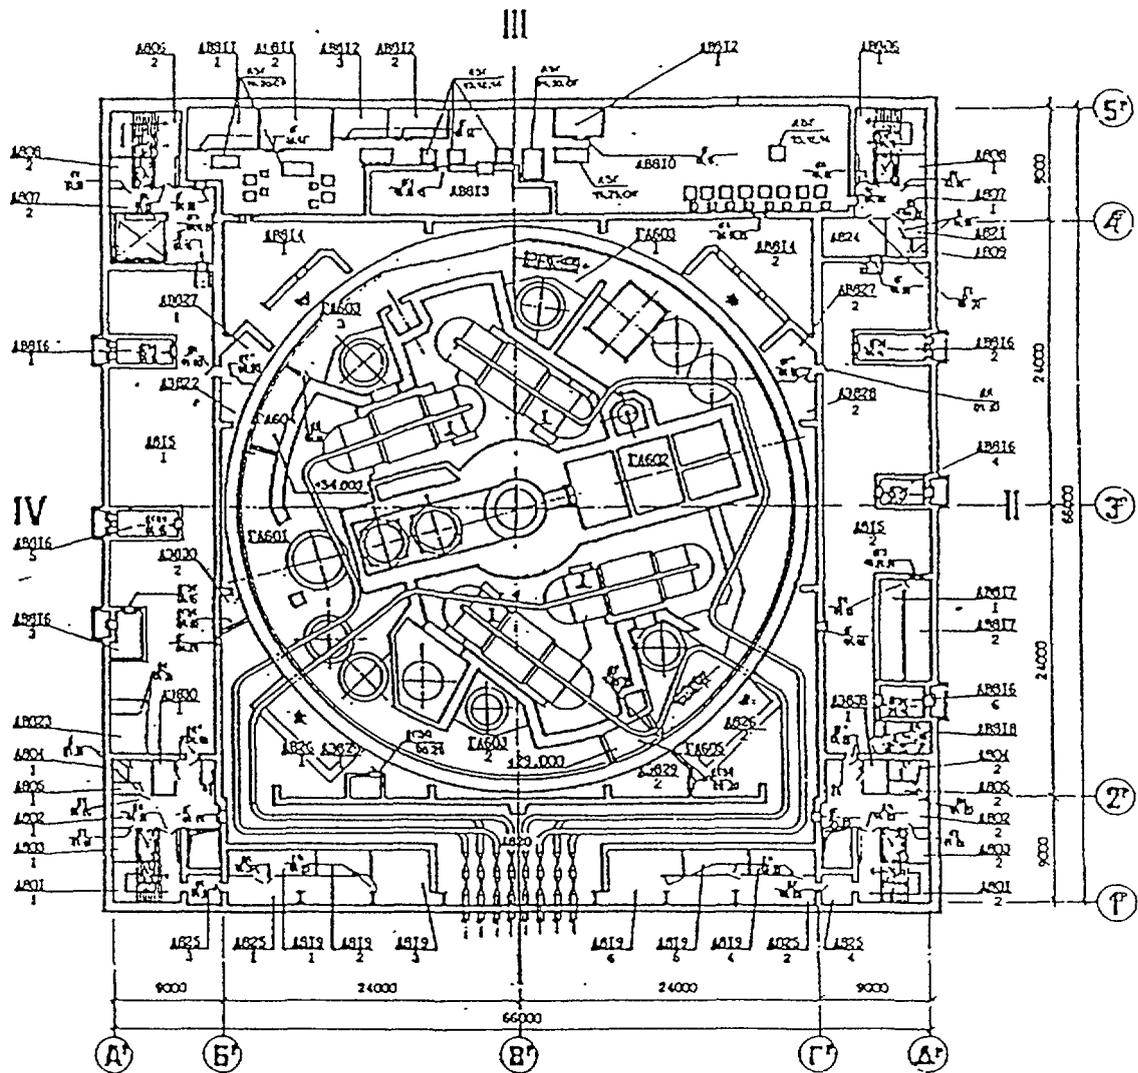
Plan view of a WWER-1000 MW reactor building.
